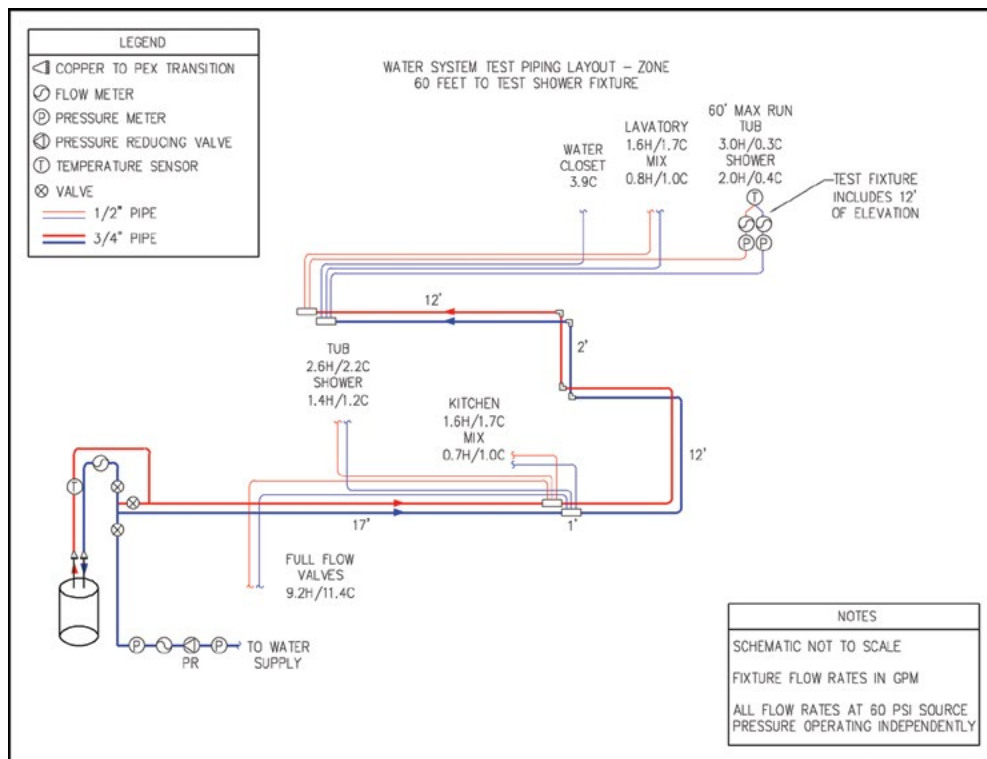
Water System Test Piping Layout – Zone, 60' to TF
